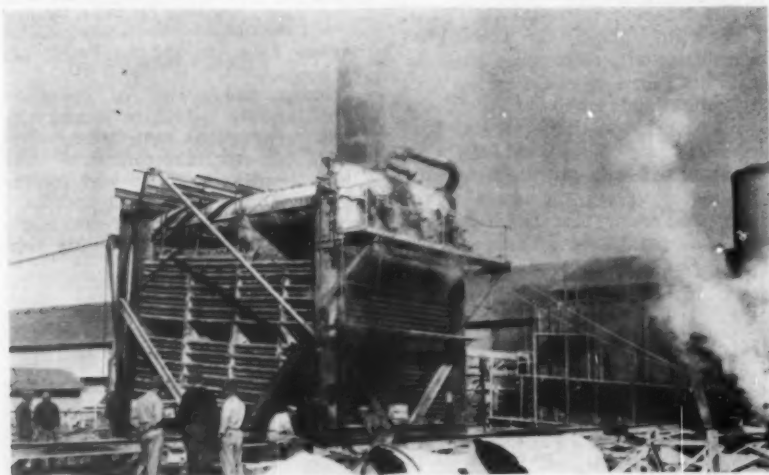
Another view of boiler in process of moving, showing 100-ton jack in position
